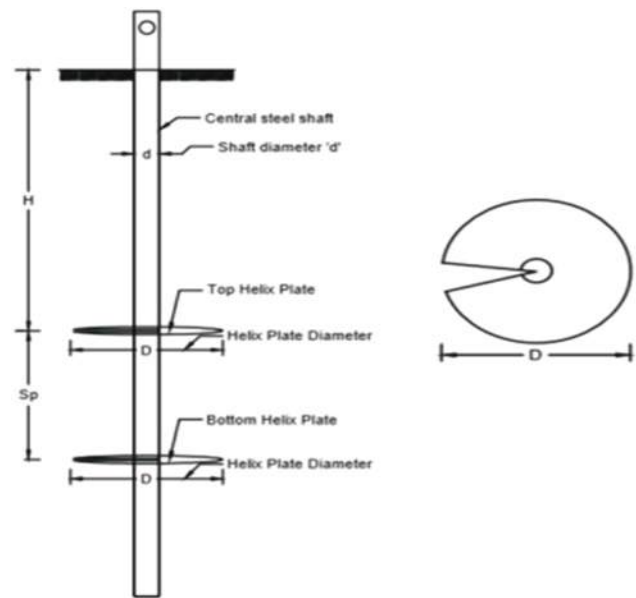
Elevation & Cross section of Helical Plate Anchor
